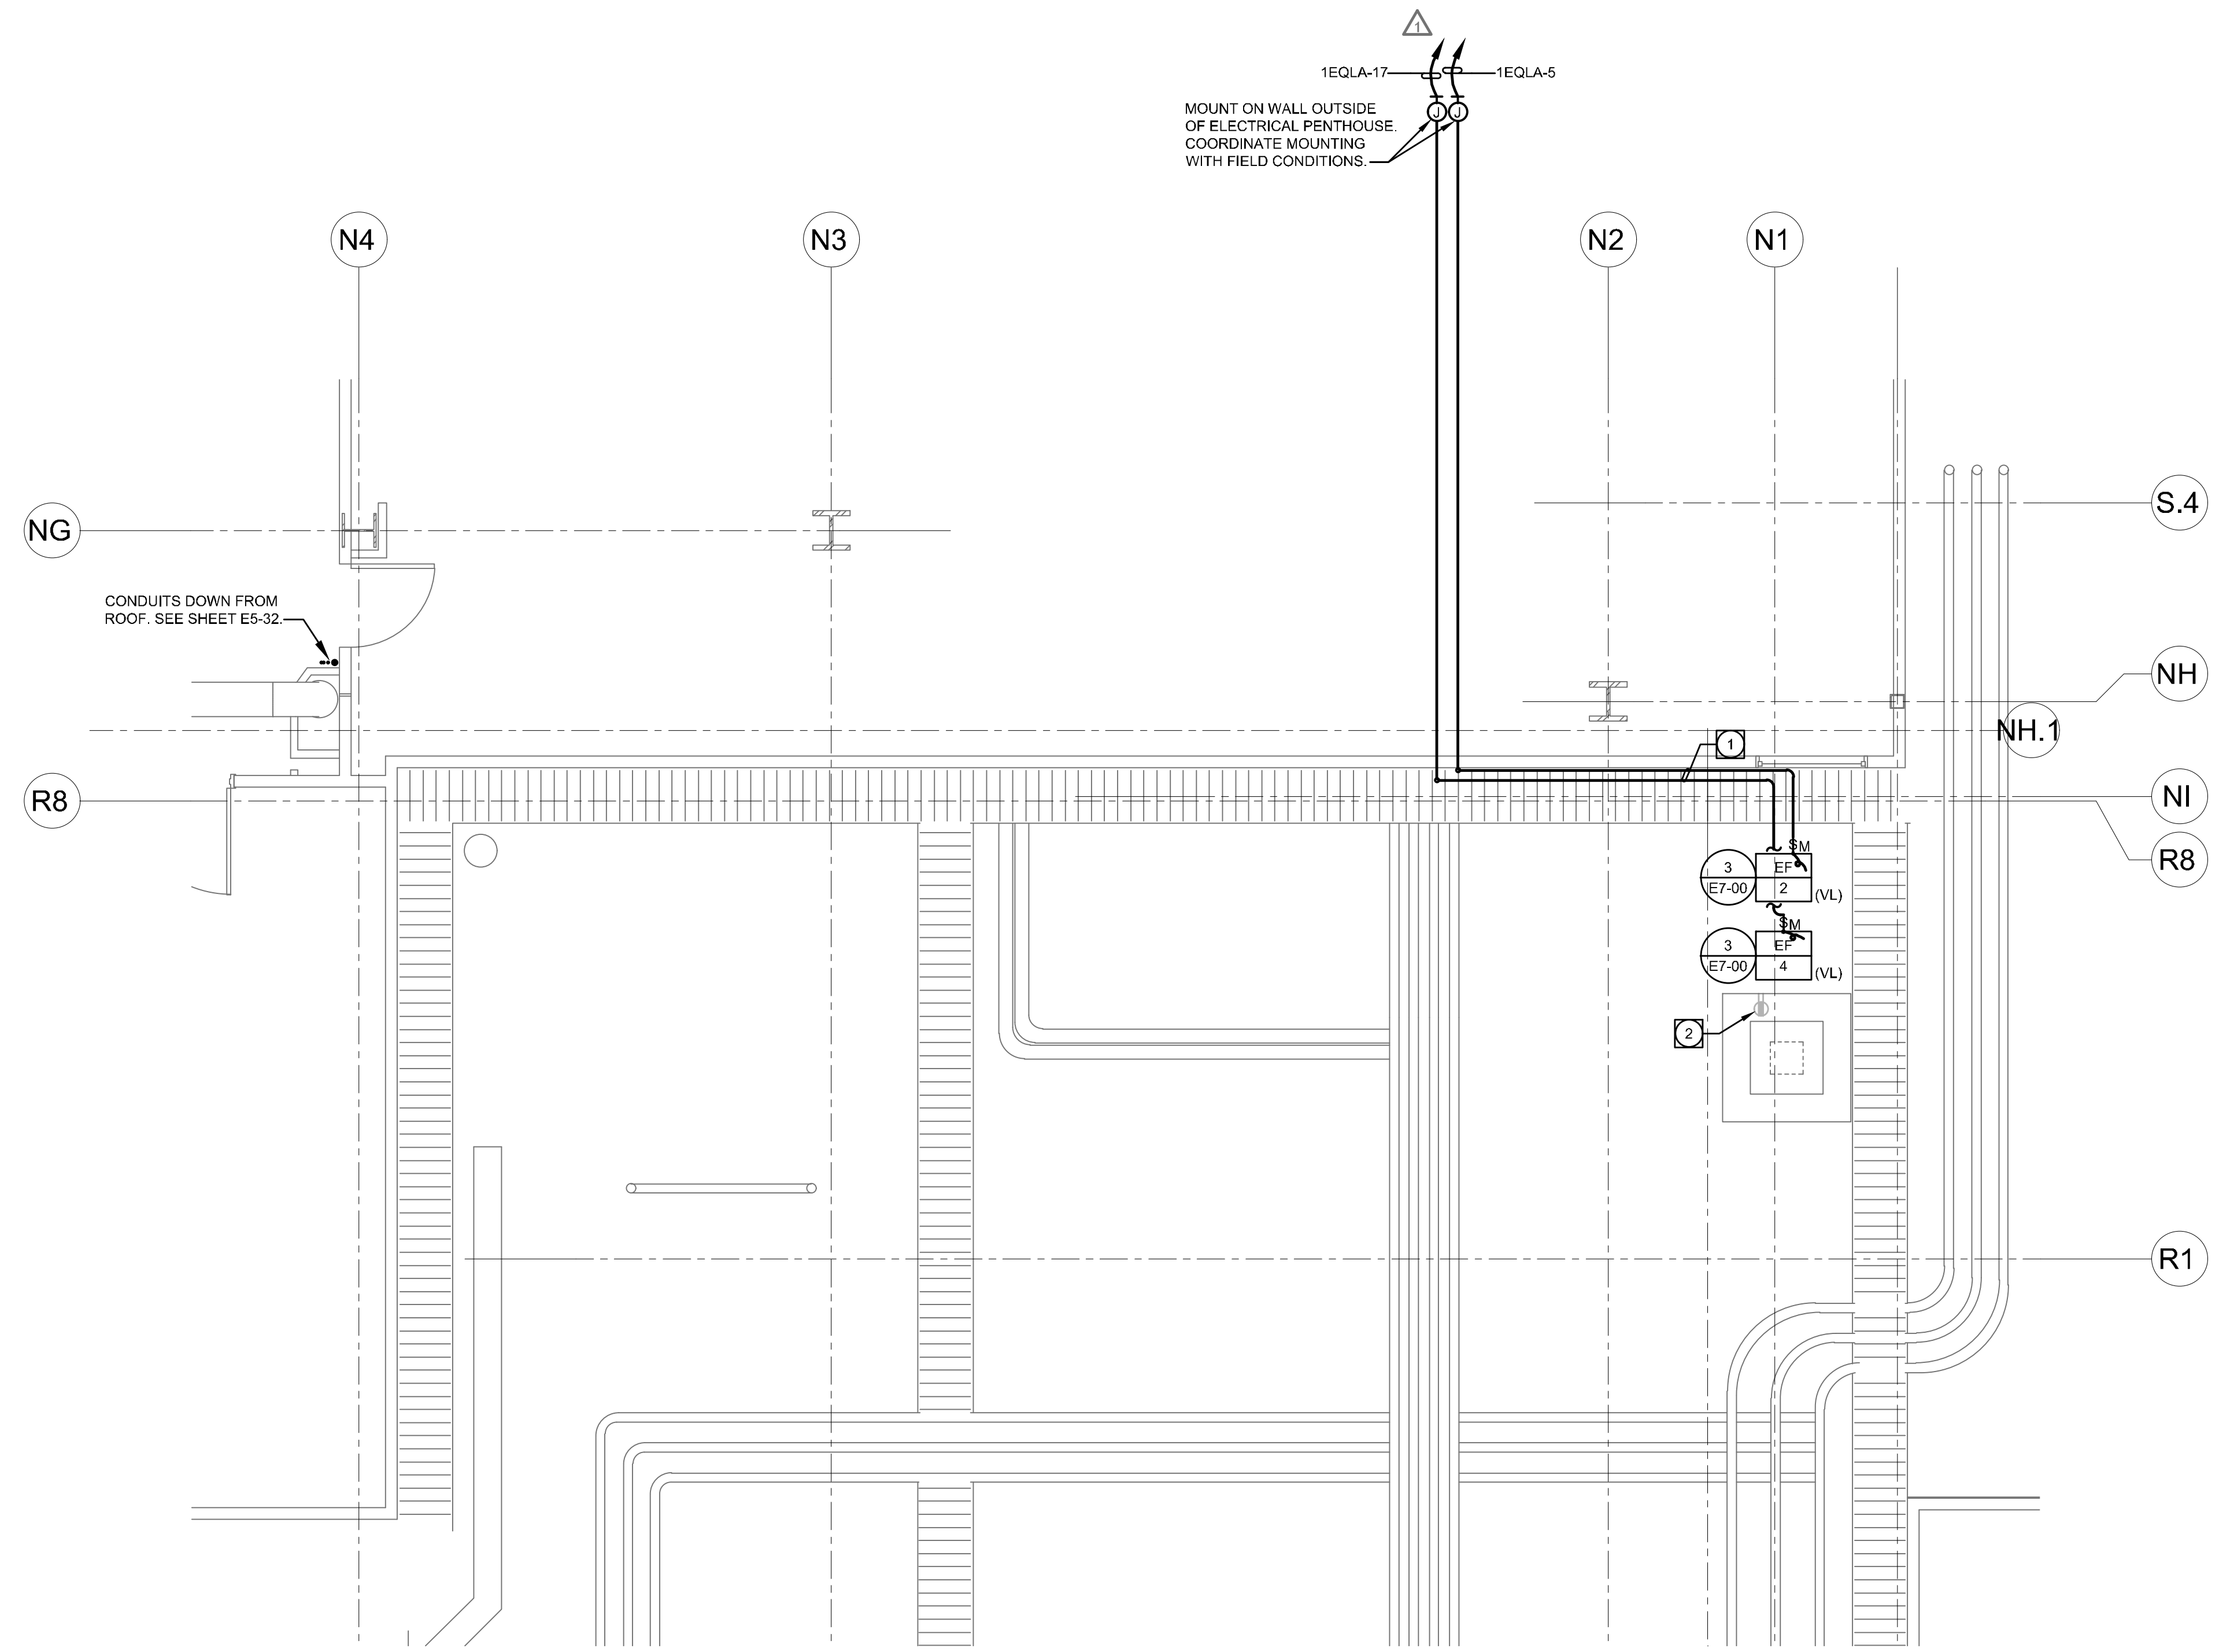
HORIZONTAL CONDUIT RACK @ 2ND FLOOR ROOF
